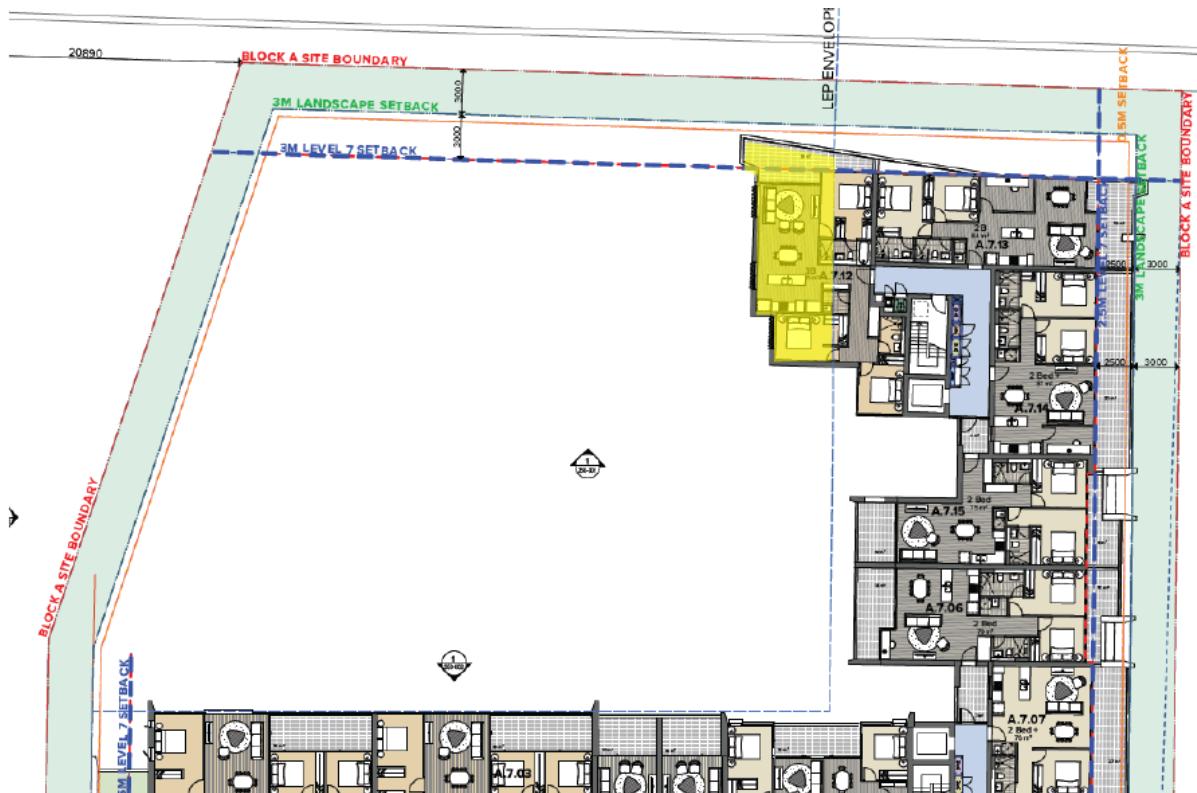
An extract of a typical upper level floor plan, demonstrating the extent of the non-compliance with the 15 metre height standard and three storey street wall to Ashmore Street.
